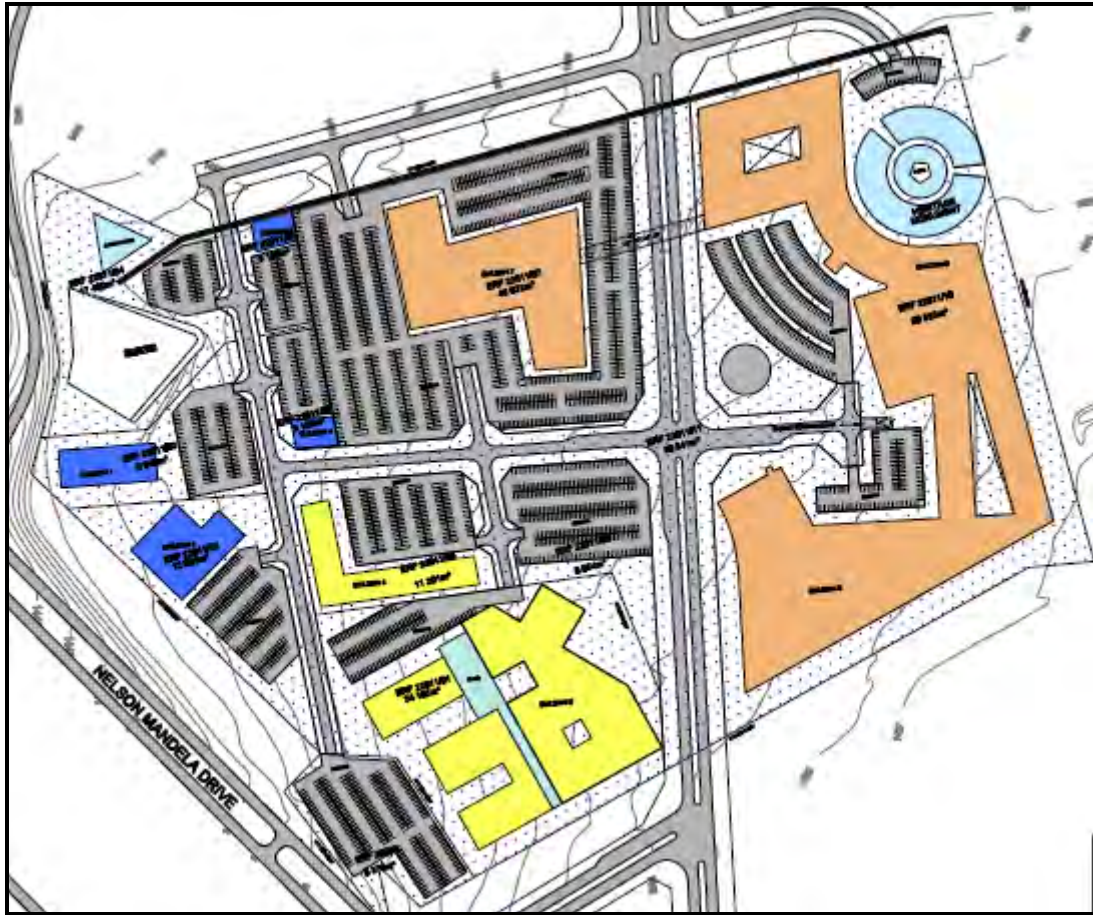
Site development plan of proposed development (refer to Annexure B for a larger image).
